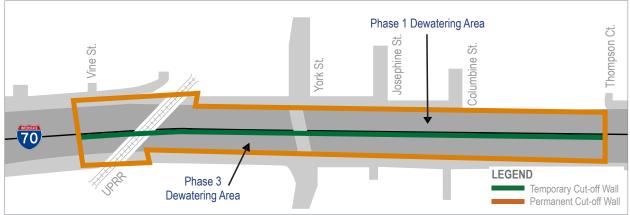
Cut-off Wall Locations to Create Bathtubs
